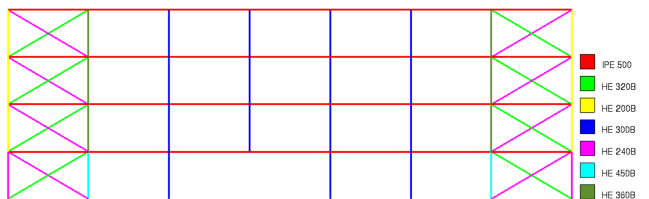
Geometries reinforced with a 4-storey, 7-span structure
